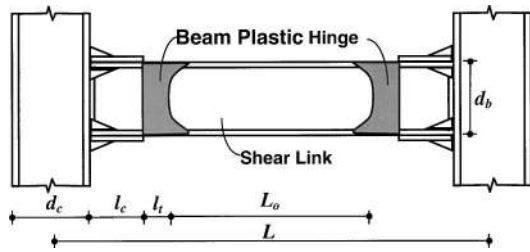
Location of beam plastic hinges at end of connection reinforcement region in typical steel beam-column frame
